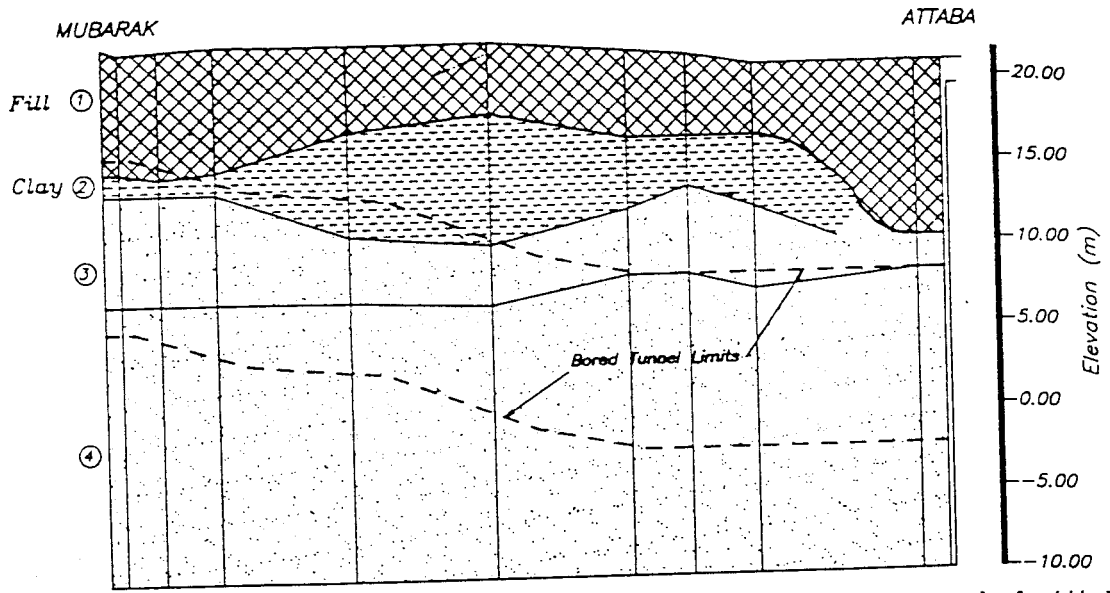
Geotechnical Longitudinal Section for Lot (20) Between Mubarak & Attaba
